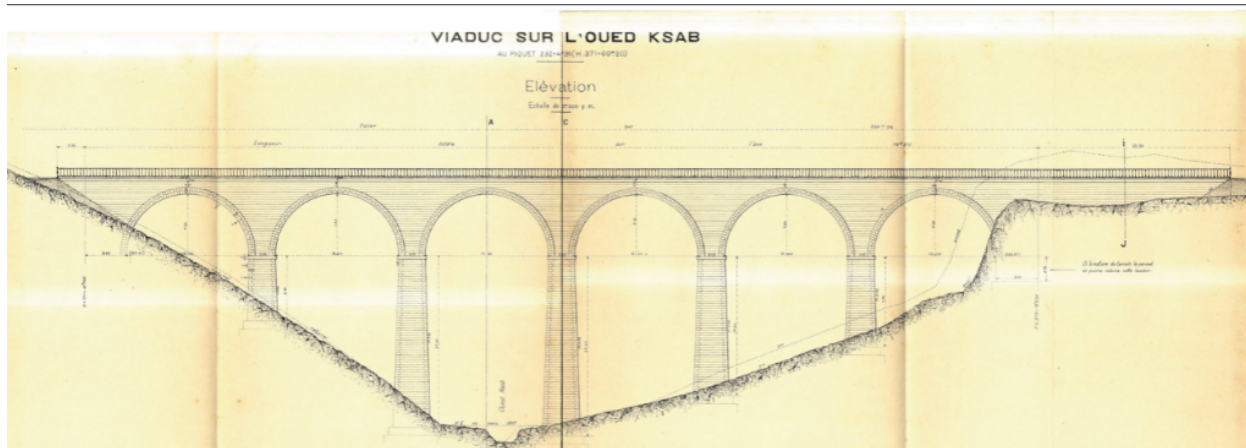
General elevation Six-arched masonry viaduct 15 m wide over the Oued Ksab (Archive of Railway Transport). (Archive [SNTF])
